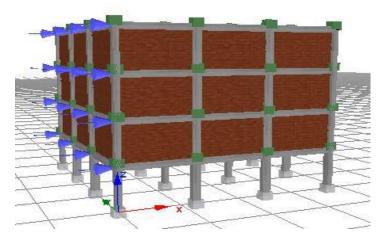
(c) - Open Ground Storey RC-infilled Frame
